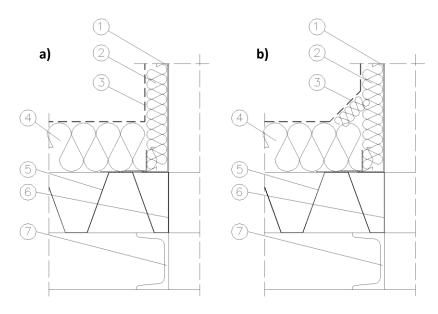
Method of sealing with roof membrane or roofing paper (DETAIL A).
